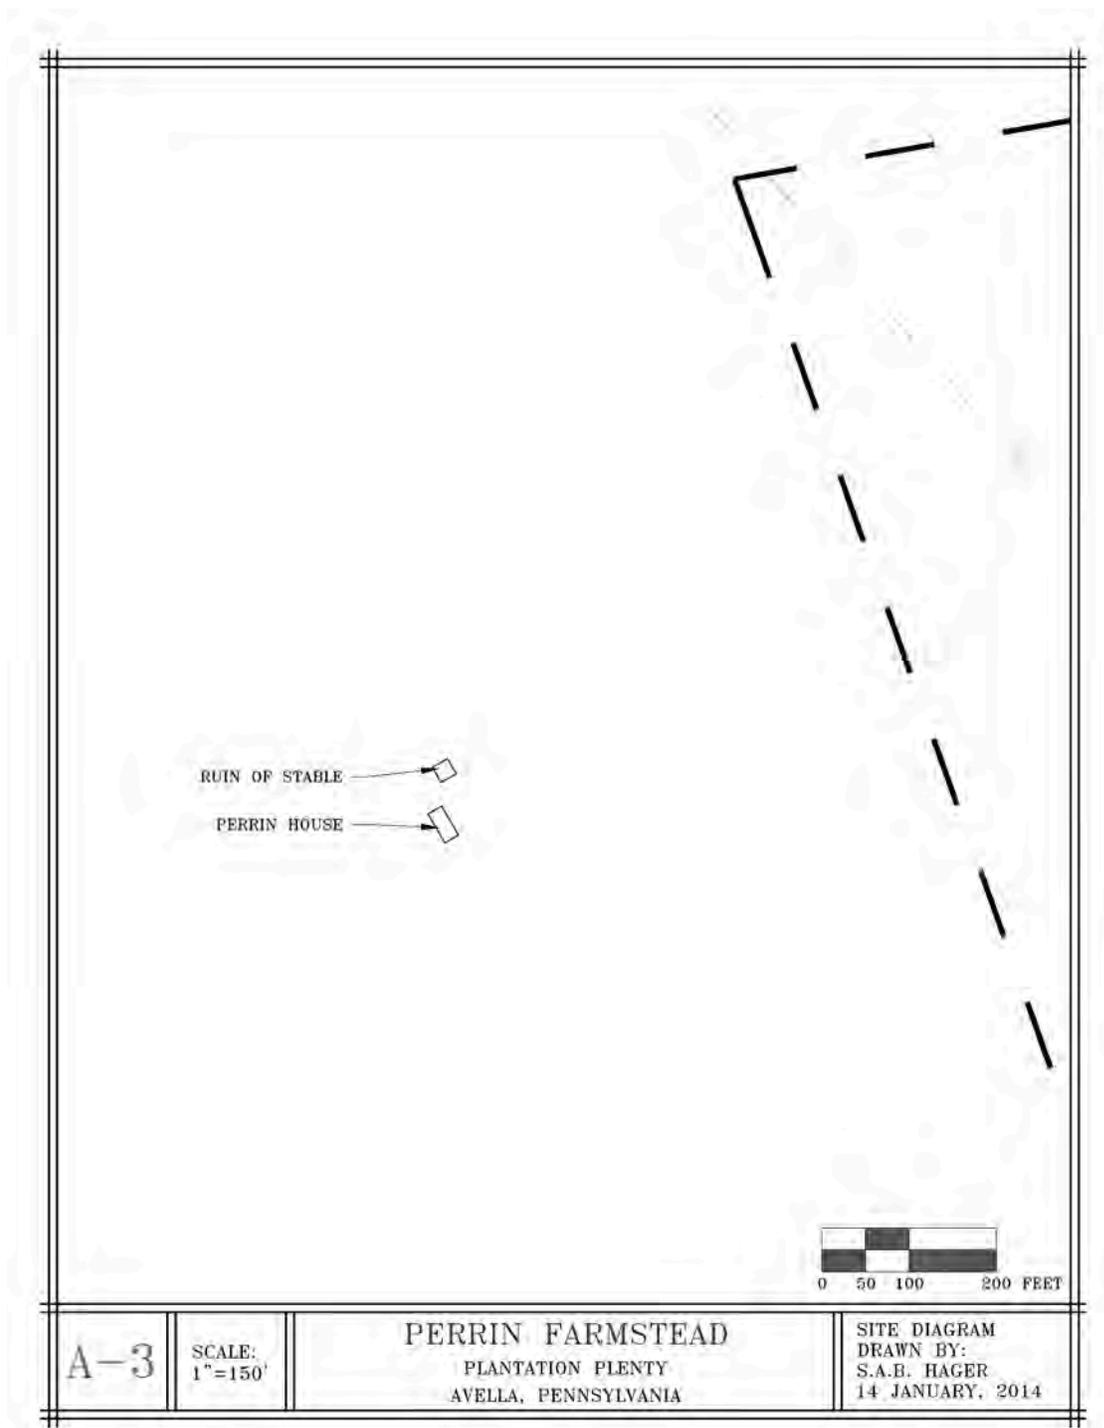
Plantation Plenty Perrin Farmstead Detailed Site Plan
